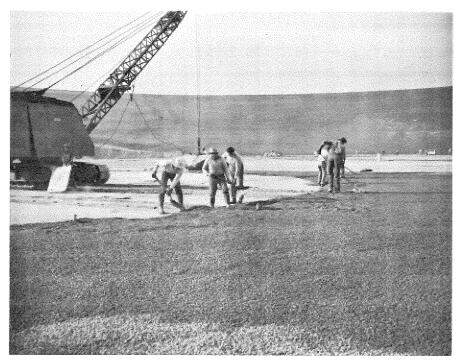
Spreading cemented pea gravel. Note grade stakes apparently driven through asphaltic membrane.
